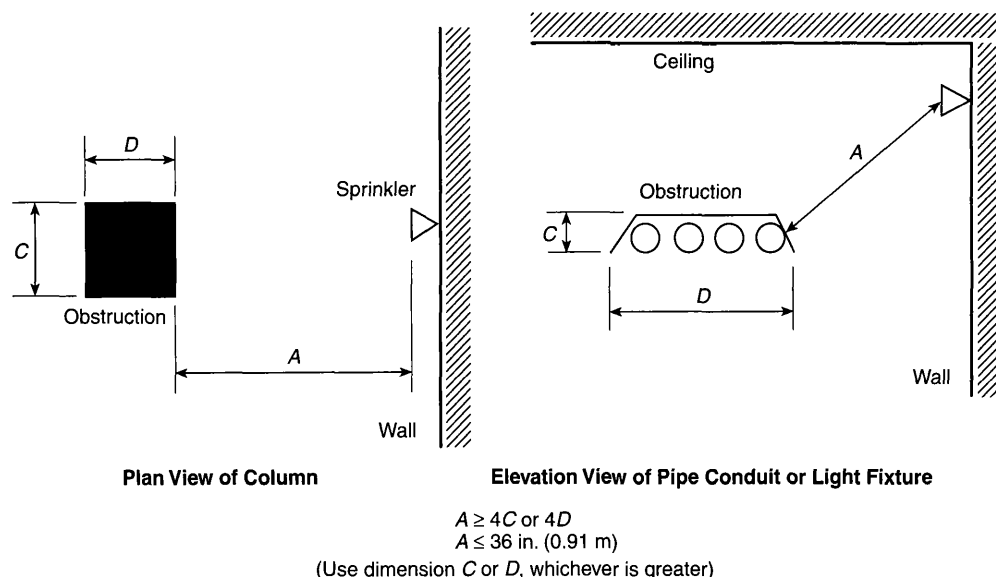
Minimum Distance from Obstruction (Extended Coverage Sidewall).
